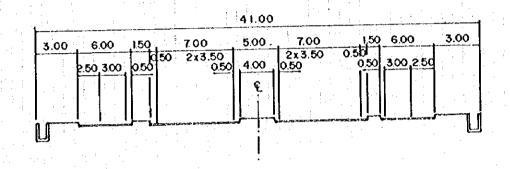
Typical Cross Section of Primary Arterial Road & Secondary Major Arterial Road (Type II/Class 1)
